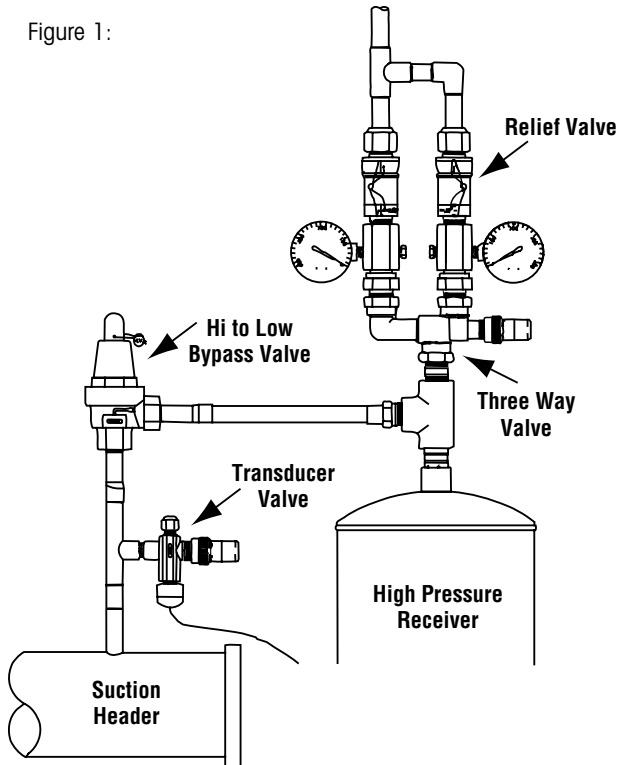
shows a typical By-Pass, relief system for a high pressure receiver. This system consists of the High/Low By-Pass valve and a dual relief valve assembly, complete with "Sentry" Rupture Disc Assemblies, all mounted on a 3-way valve. The drawing shows a High/Low By-Pass Valve in operation.
